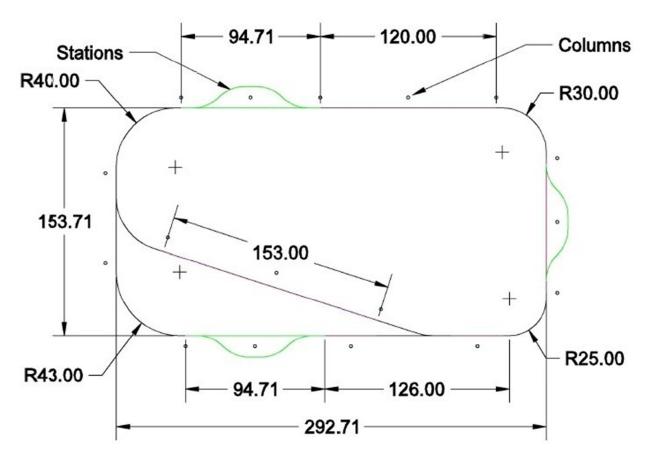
Track Layout of 1/12th Scale Model. Dimensions are in inches.
